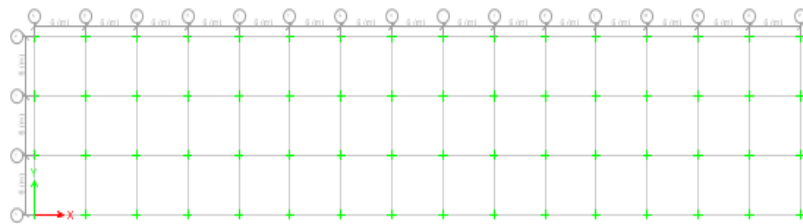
Building plan dimension(Common to all floors, all models, units m^o).
